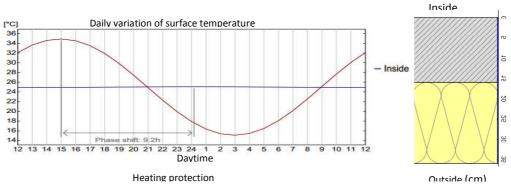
Cross-section of exterior wall and diagram of heat protection (http://www.u-wert.net)
